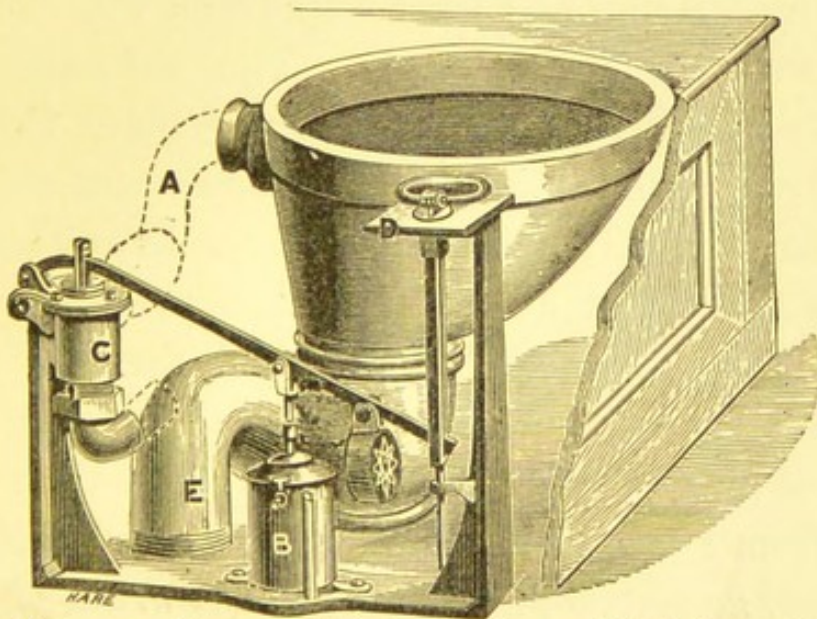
View of "Artisan" Closet with Valve and Regulator Supply.\
